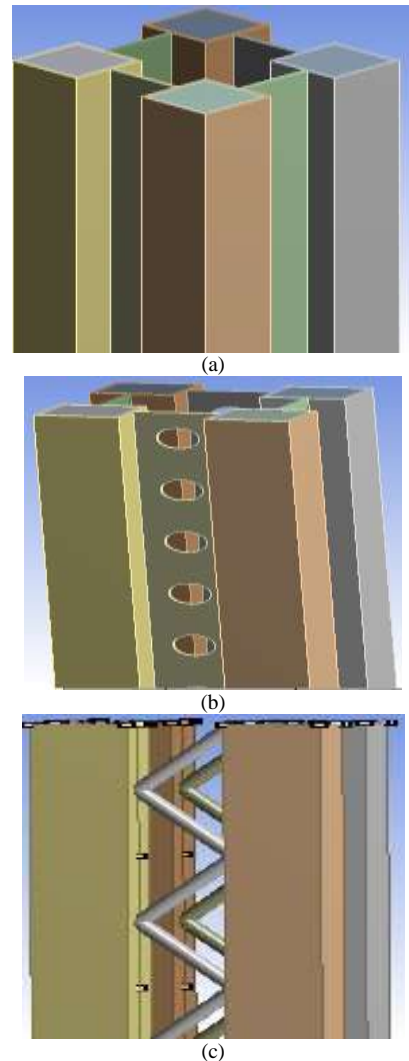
Rectangular CFST column models with (a) vertical steel plate, (b) perfobond steel plate, (c) lacing bar.
